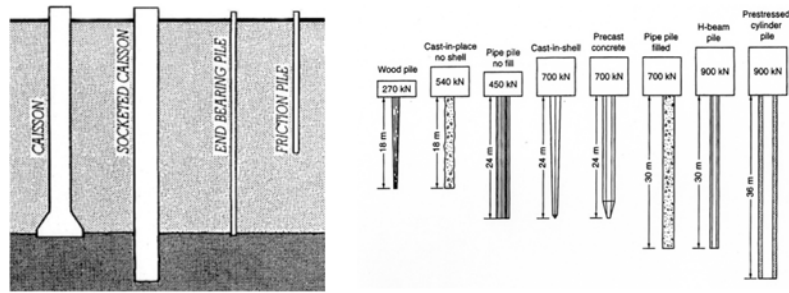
Types of Piles. *Fundamentals of Building Construction*, Edward Allen and Joseph Iano. Figure 2.37 p56
